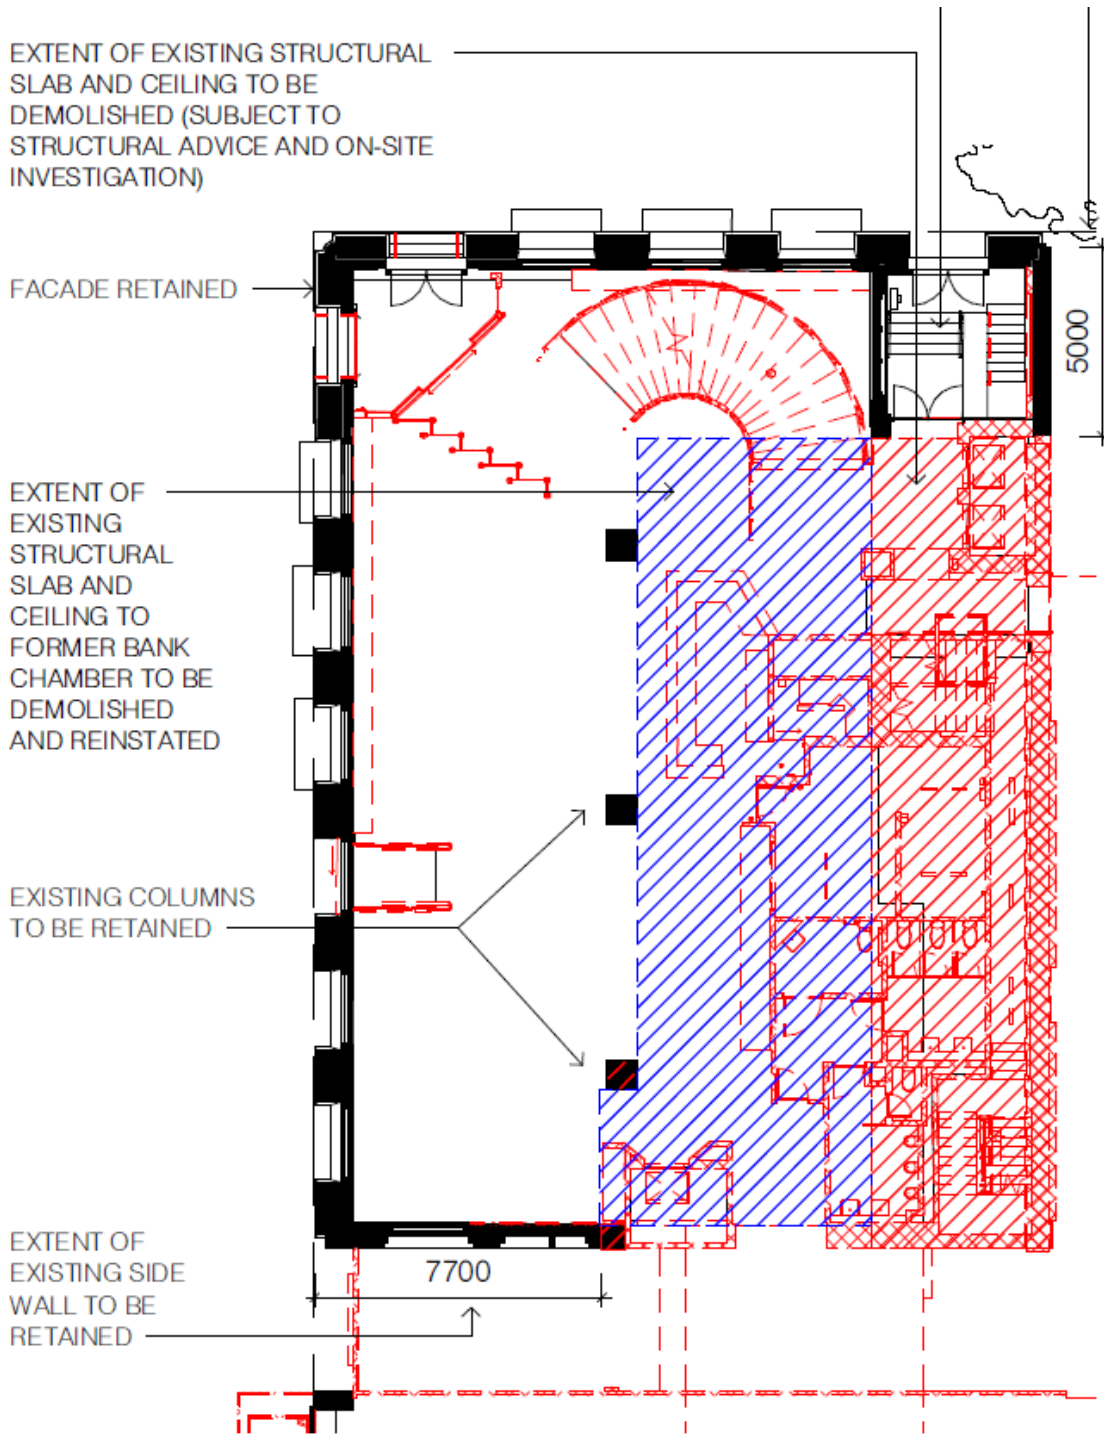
Extent of demolition to the south and east walls of the former State Savings Bank – this is the ground floor level plan
